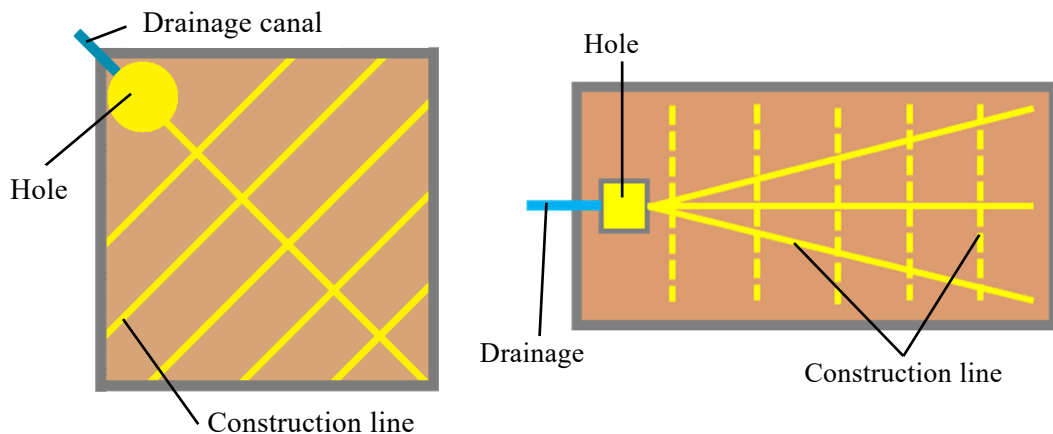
Example 3: If an outlet cannot be created because the drainage canal is made of concrete or other materials
